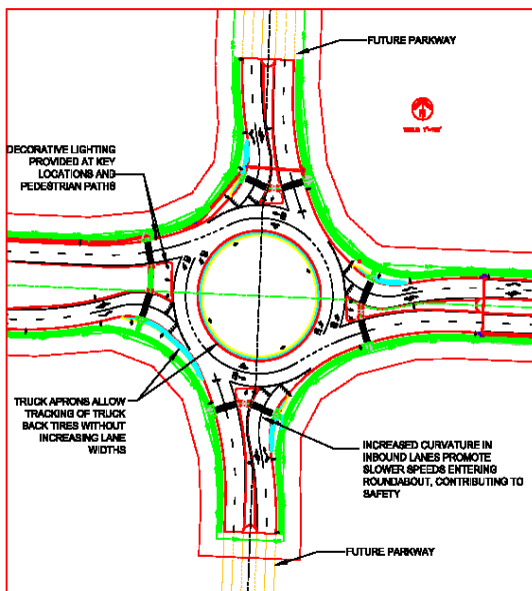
PLAN OF ROUNDABOUT AT PAULINE WHITAKER PARKWAY
